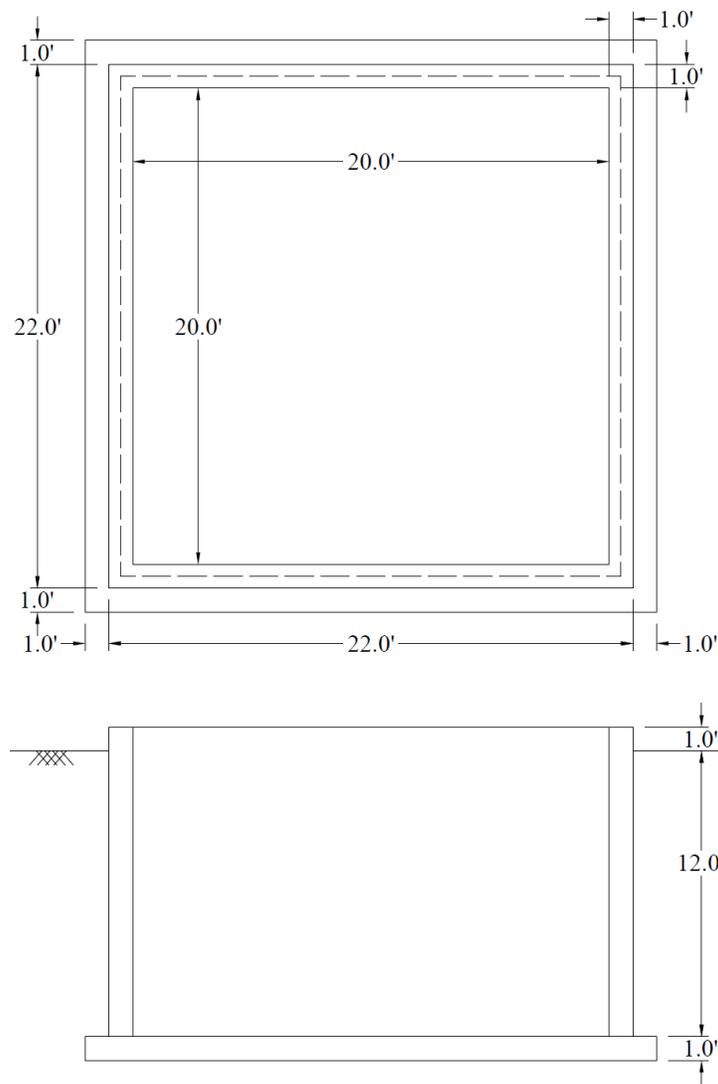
Rectangular Concrete Tank Plan and Elevation
